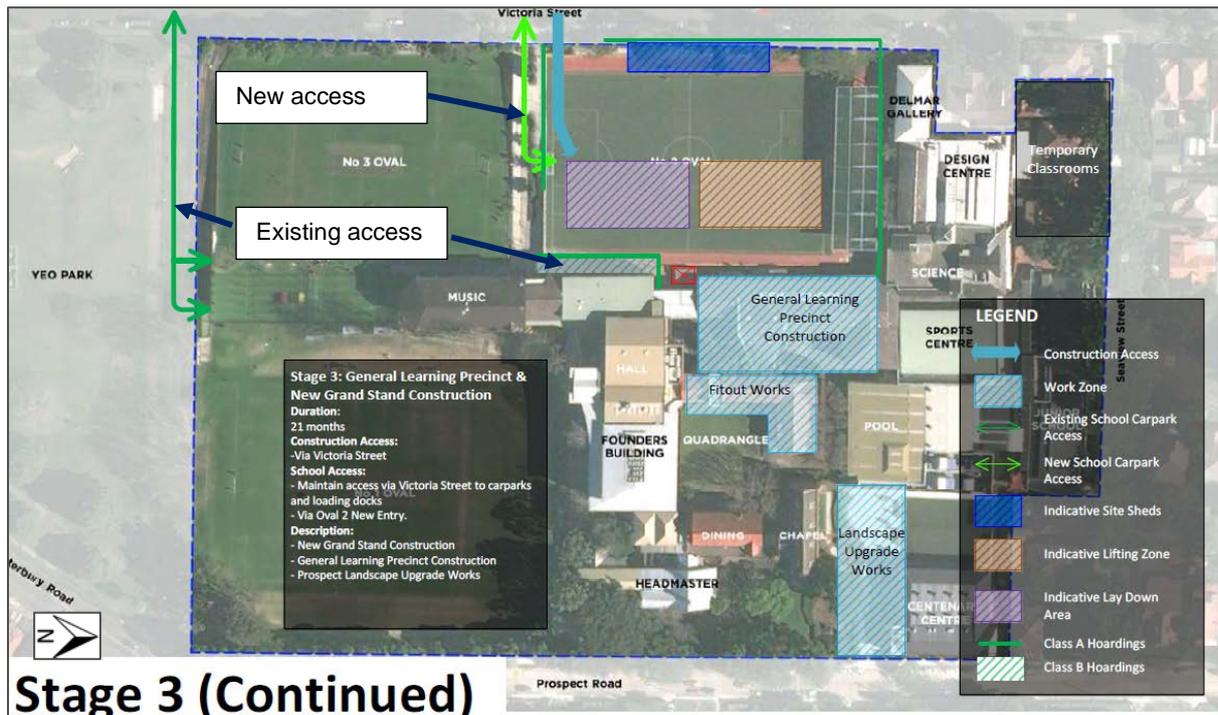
| Stage 3 plan showing proposed access arrangements (Source: Applicant's RtS 2021)
